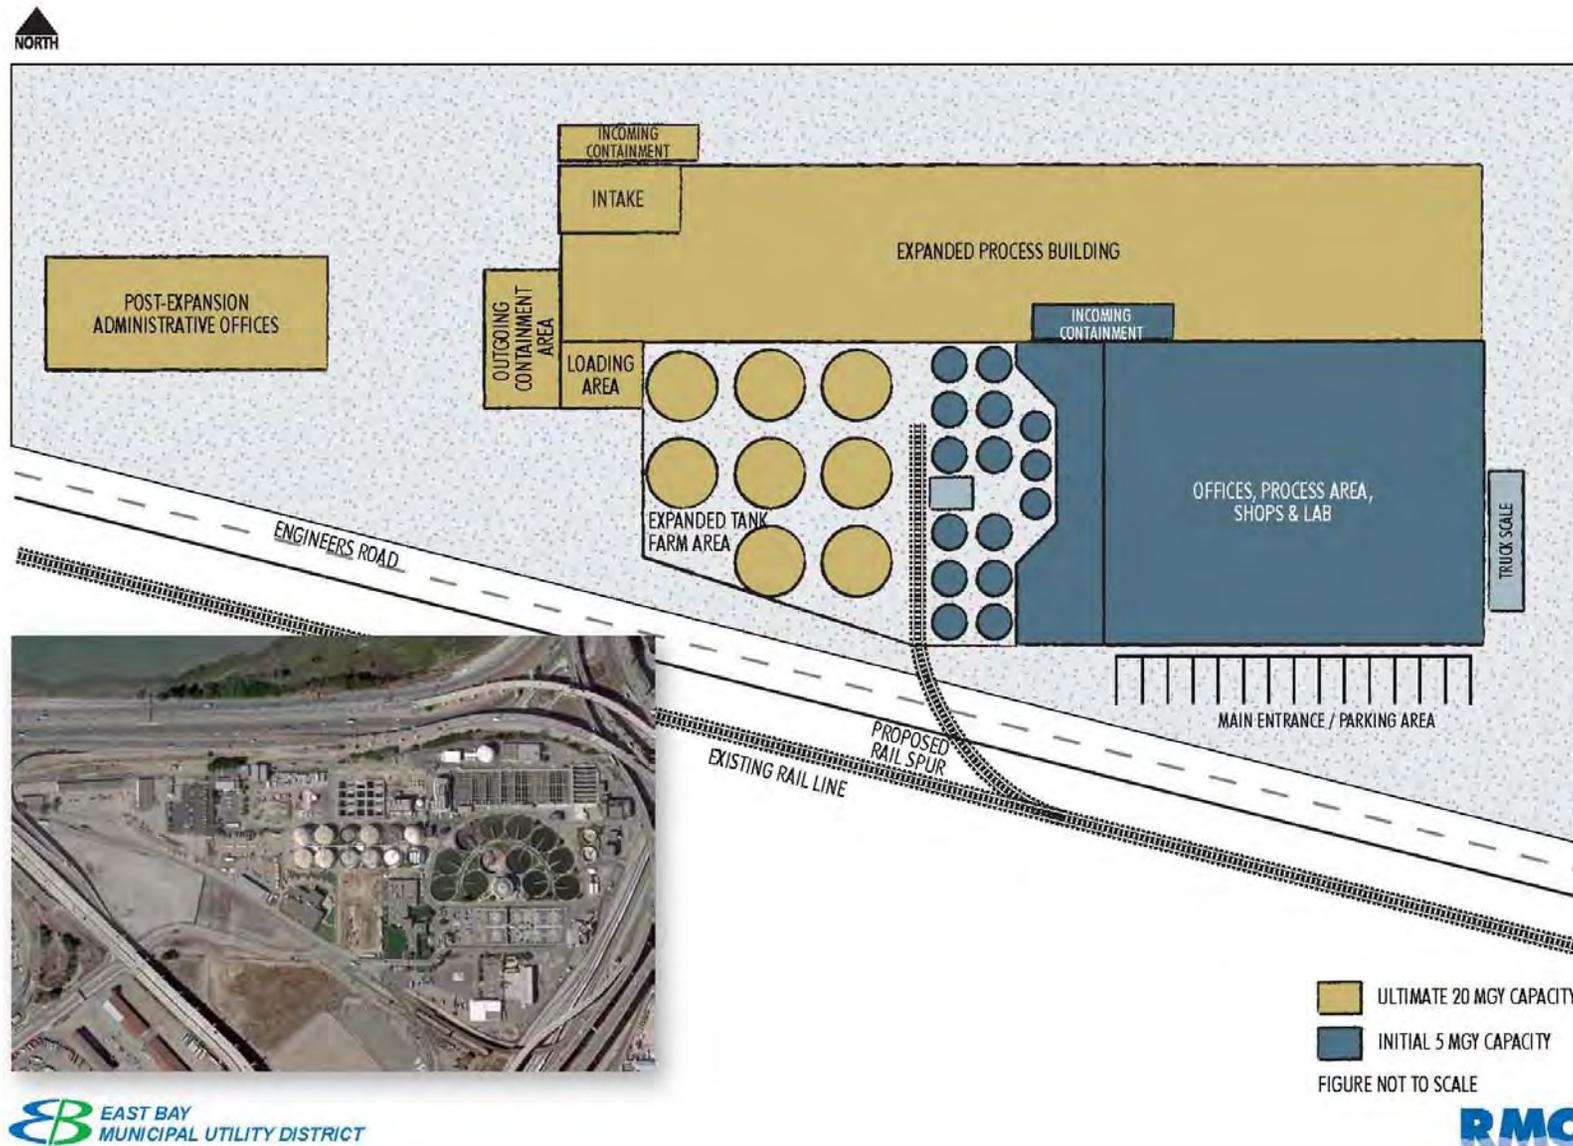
Biodiesel Production Facility Preliminary Site Plan
